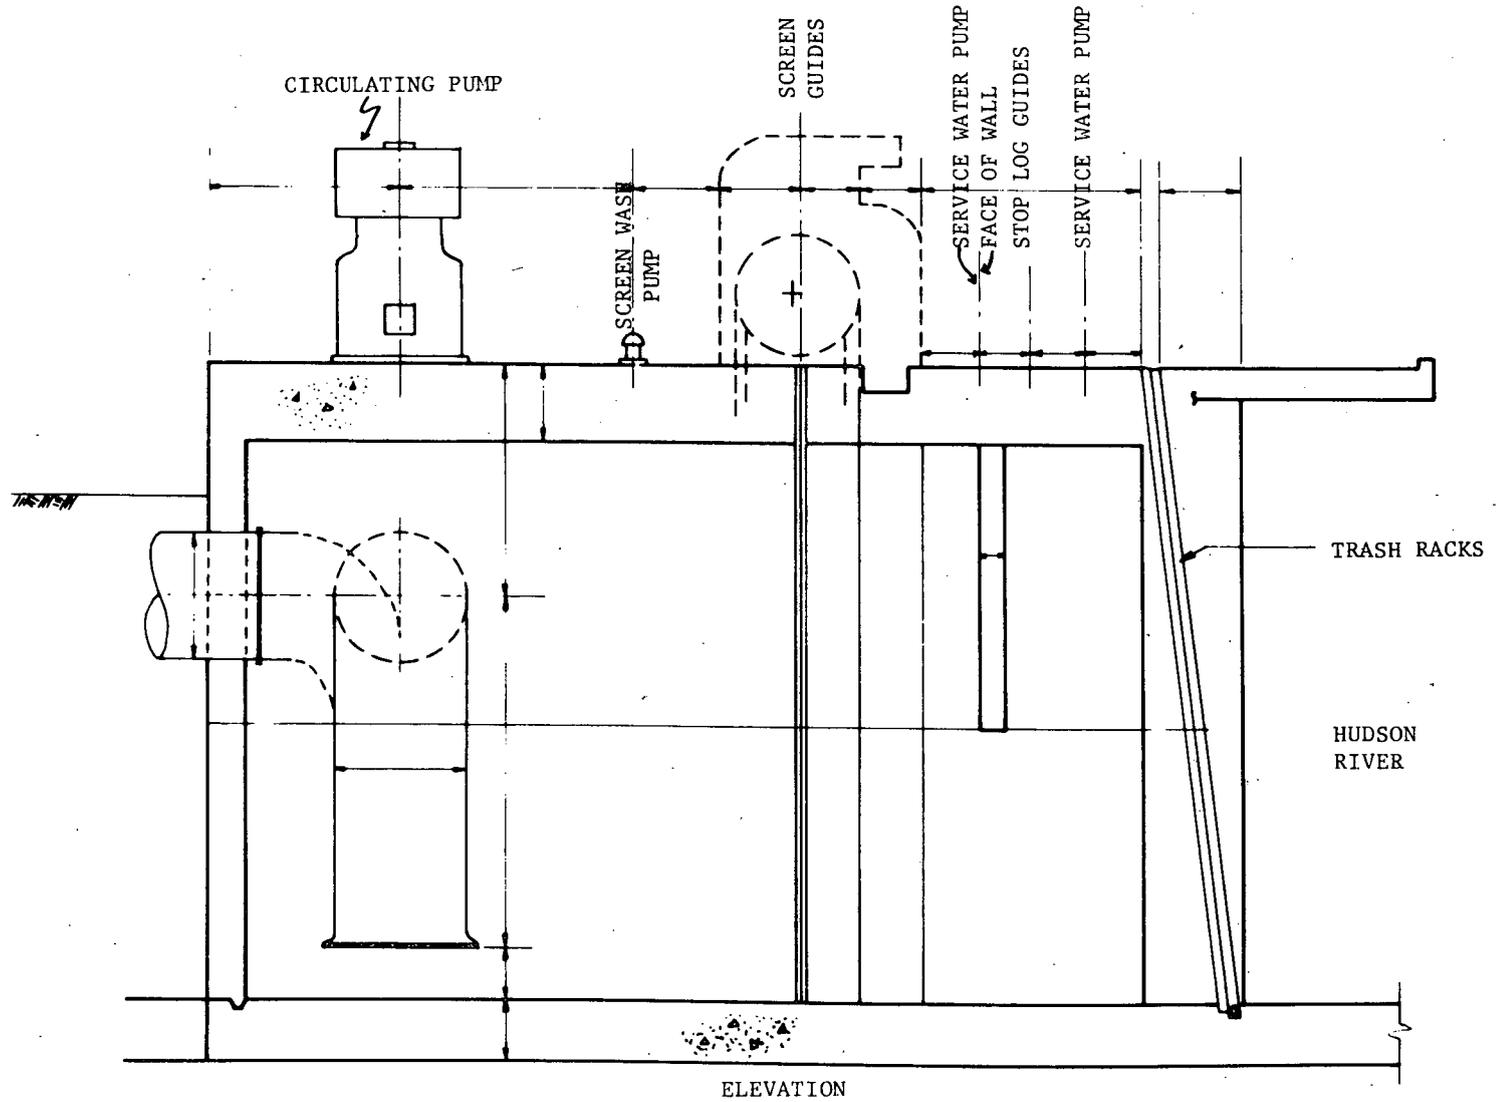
Lovett Plant Units 4 and 5 Intake Structure Profile
